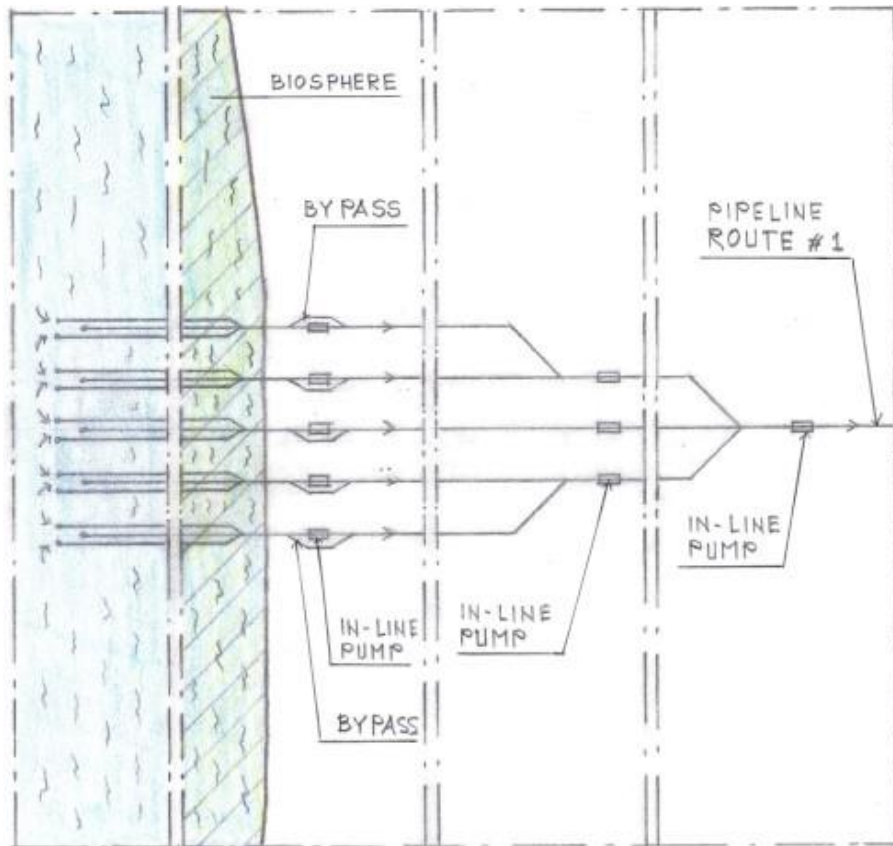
Cross-Sectional view of the first segment of Pipeline Route #1
